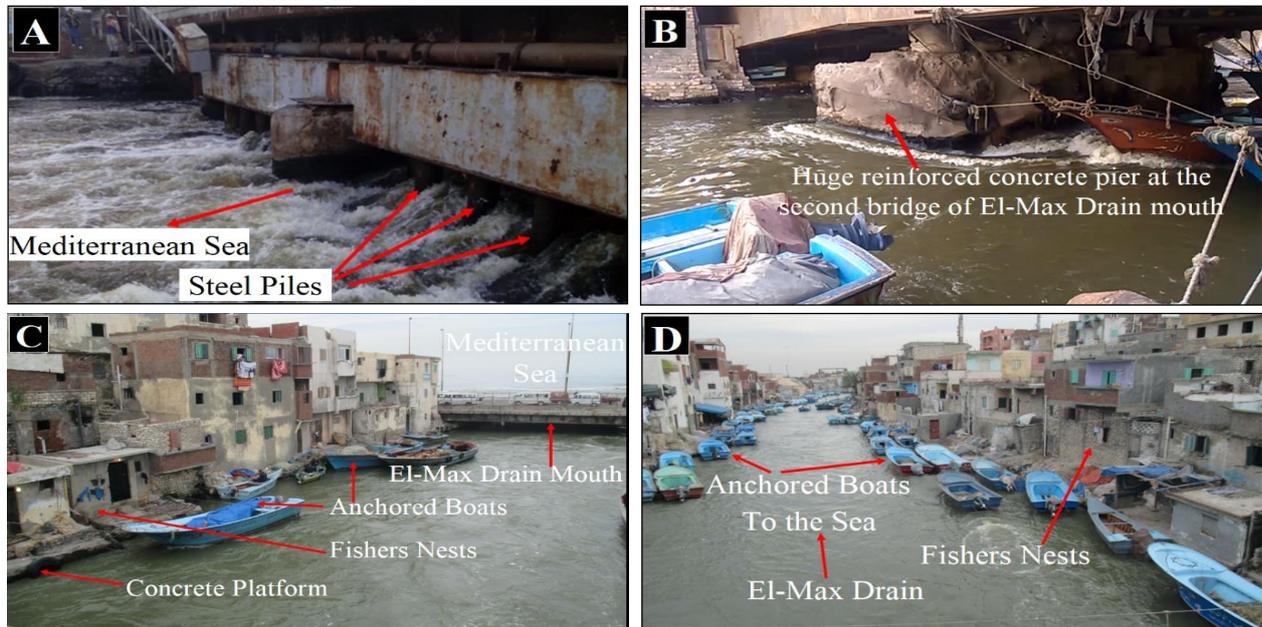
Restrictions along the El-Max Drain path: (A) water level rising caused by steel piles filled with plain concrete at the mouth; (B) channel throttle caused by a large reinforced concrete pier at the second bridge at the mouth; (C) and (D) channel throttle caused by anchored boats, concrete platforms, and fisherman's nests on January 6, 2016 [1].
